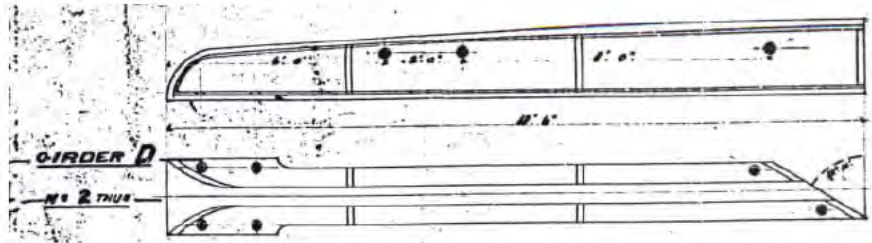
Shorter girder from L&YR General Arrangement Drawing, 1935
